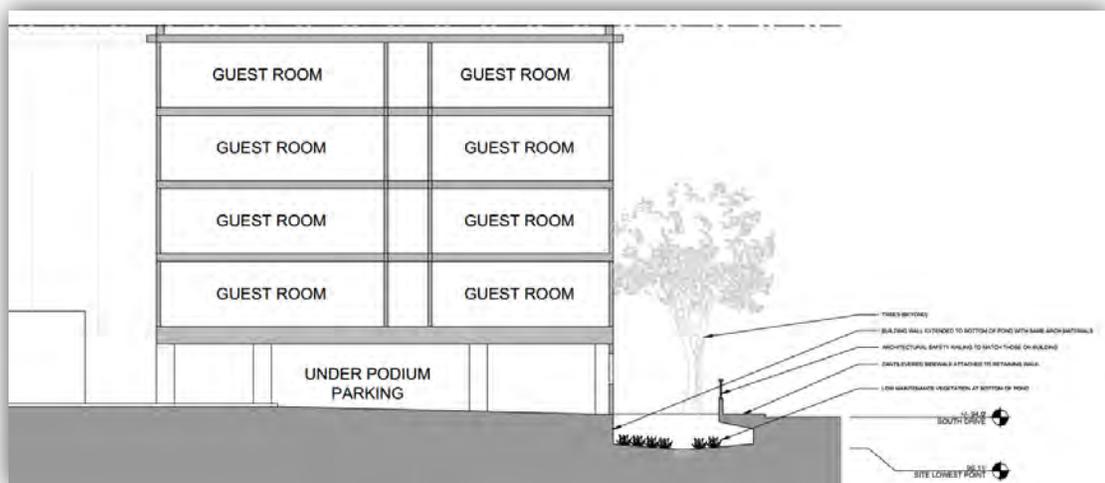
Cross section illustrating walkway proposed to cantilever over the detention
